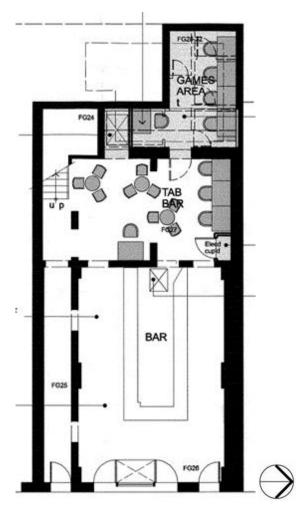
Fortune of War Hotel, 137 George Street, ground floor front plan, showing 2010–2011 alterations Source: PMNSW, Drawing ROX-410-DA-0027-CP.
